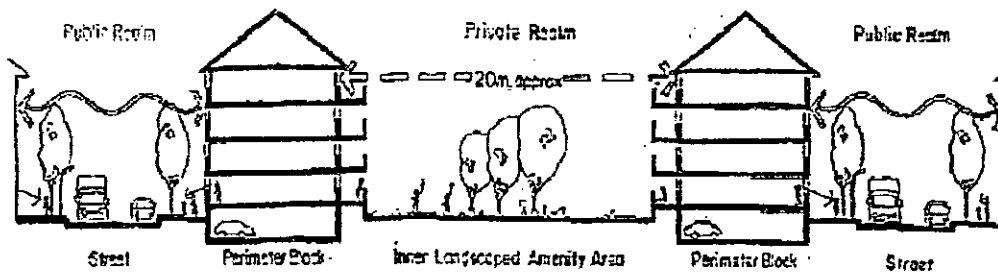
Typical arrangement of buildings placed around the perimeter of a street block to provide clear definition of public and private areas.
